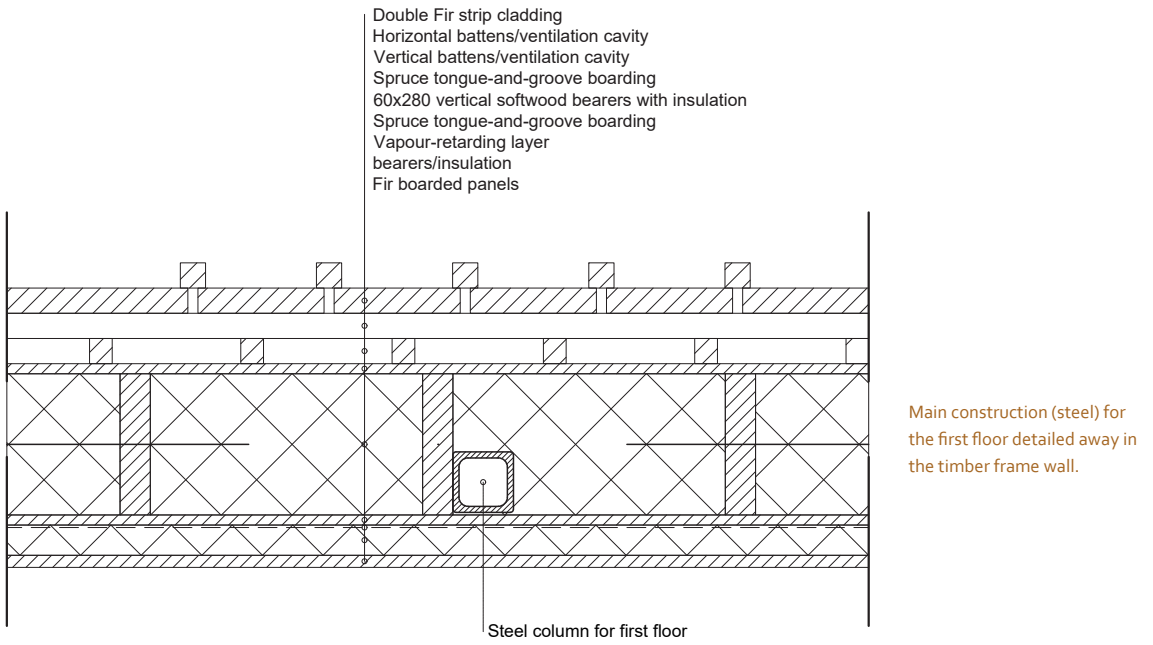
Horizontal detail of wall build up with steel construction for first floor, 1:15.
